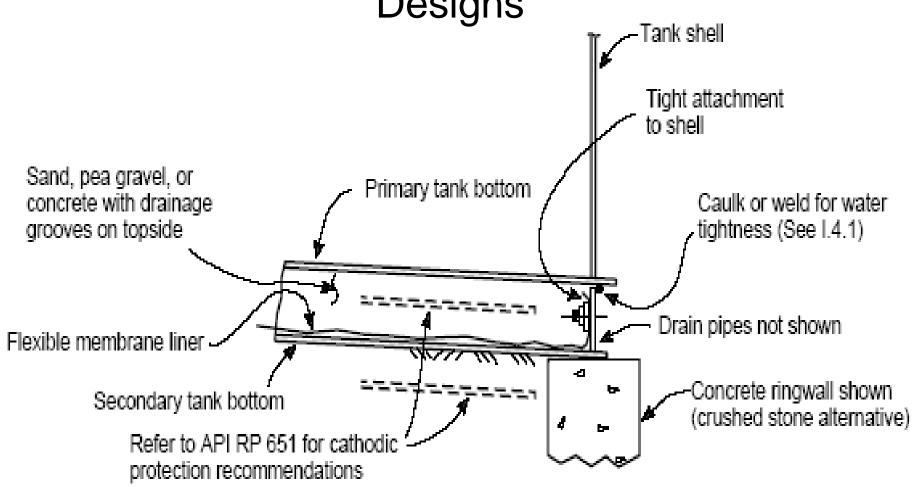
Double Steel Bottom with Leak Detection at the Tank Perimeter (Typical Arrangement)
